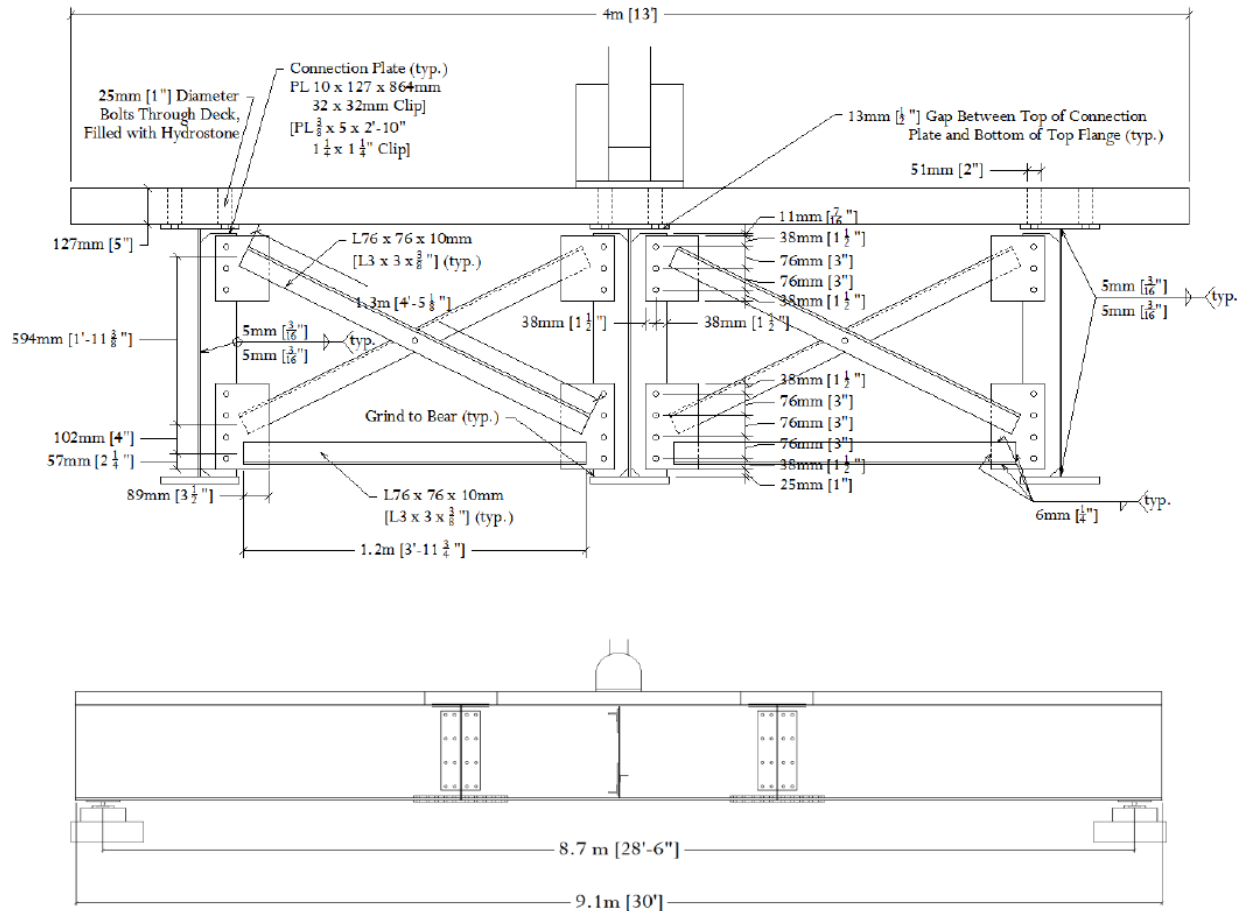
Test set-up for 9.1 m (30 ft.) three girder test bridge (Hartman 2013).
